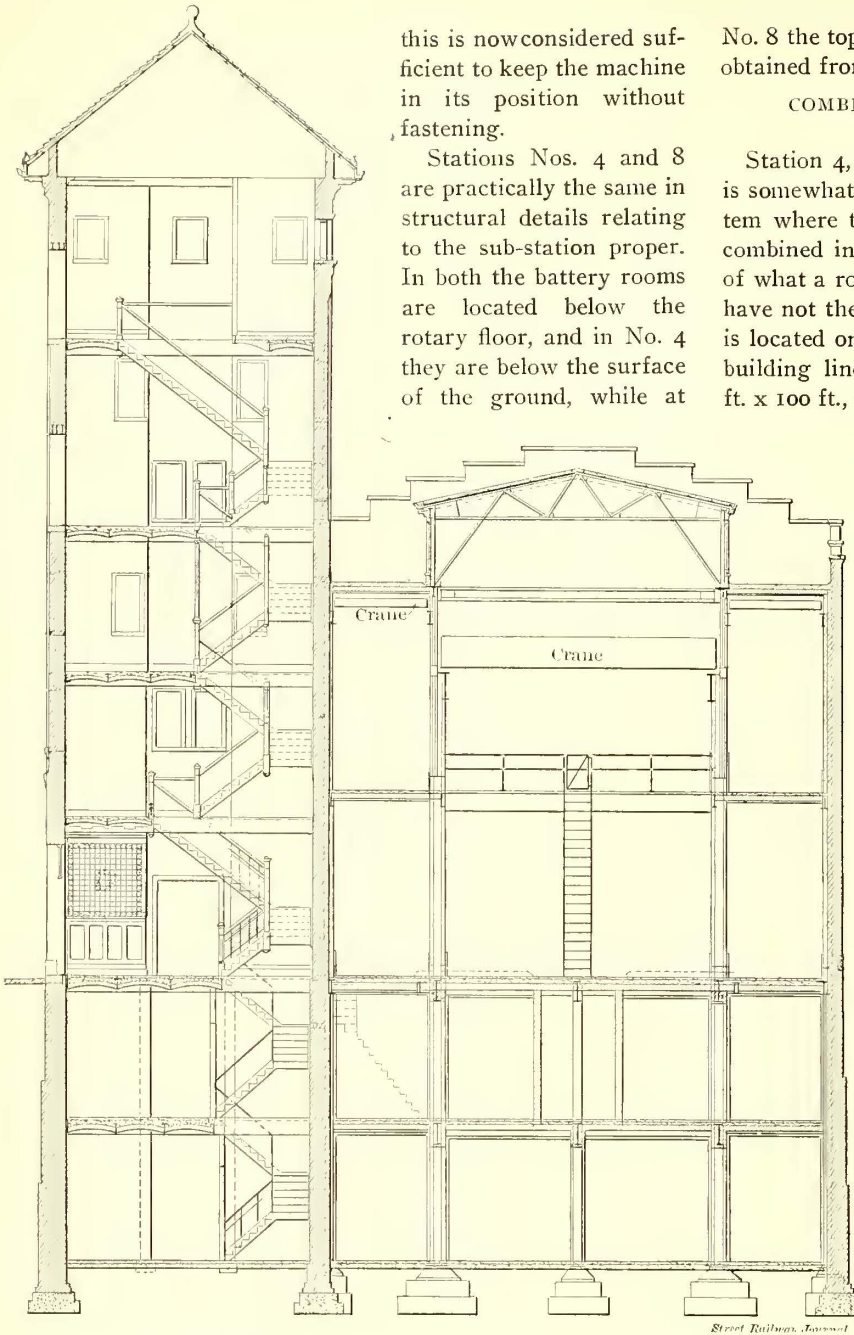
CROSS-SECTION OF SUB-STATION NO. 4, AND PASSENGER TOWER
